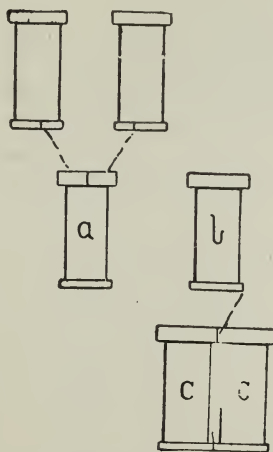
Cracks in Brick Walls Caused by Piers and Openings.
